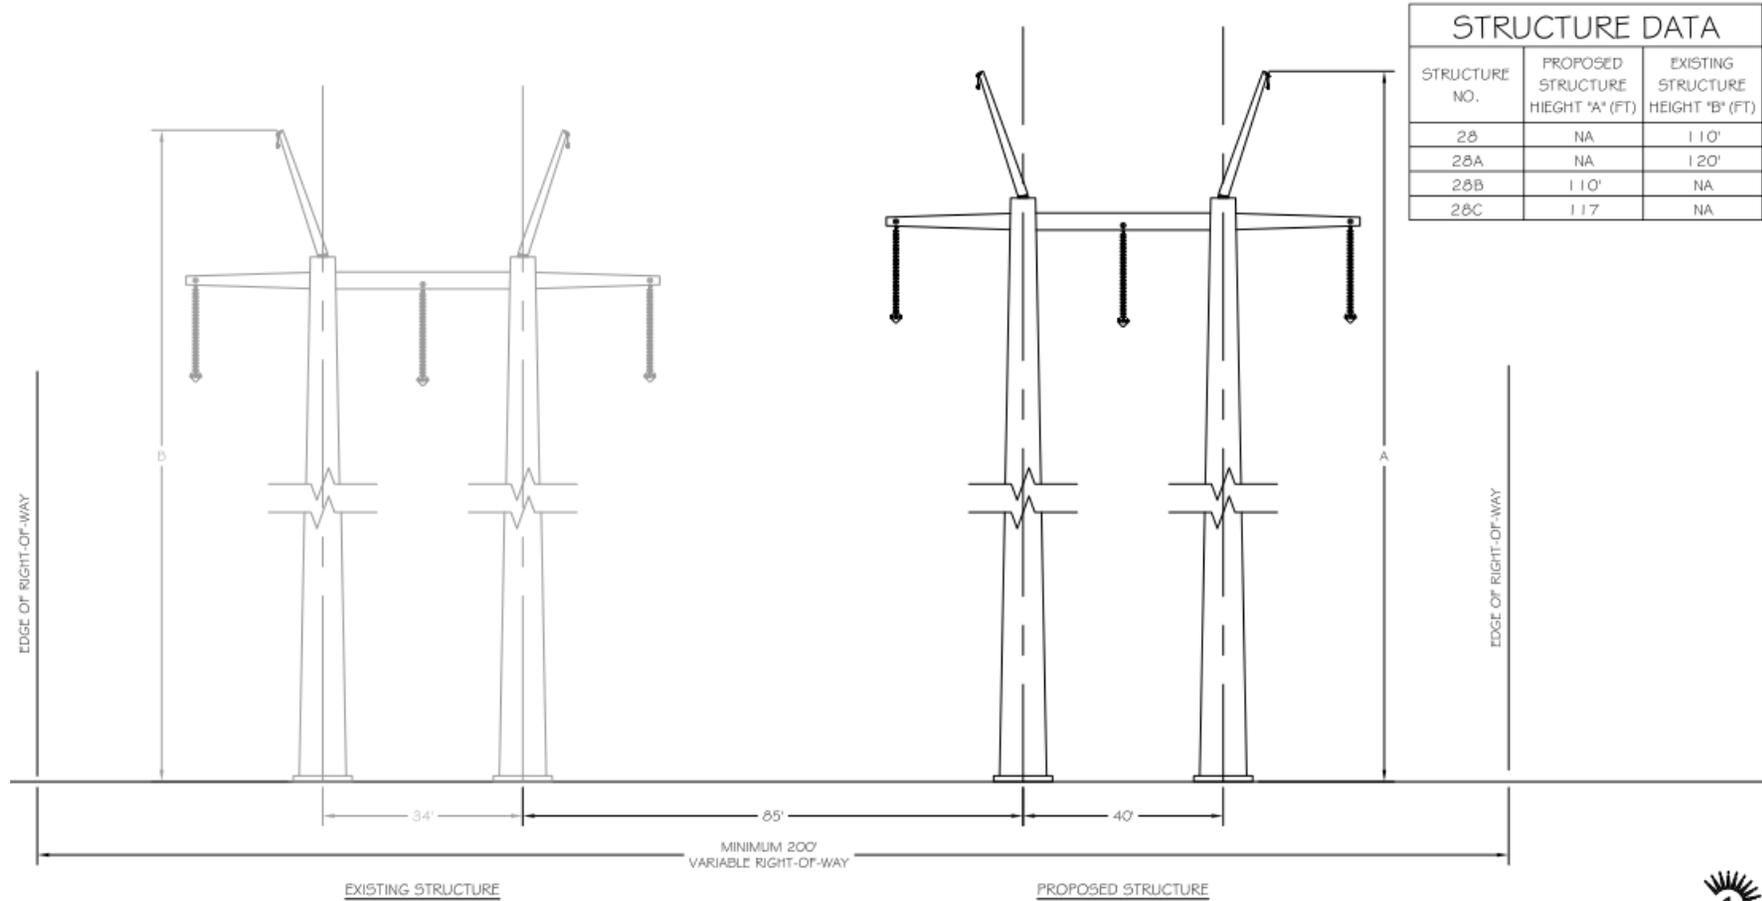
Typical Double-Circuit 2-Pole Dead-end Angled Structure ROW Cross Section
